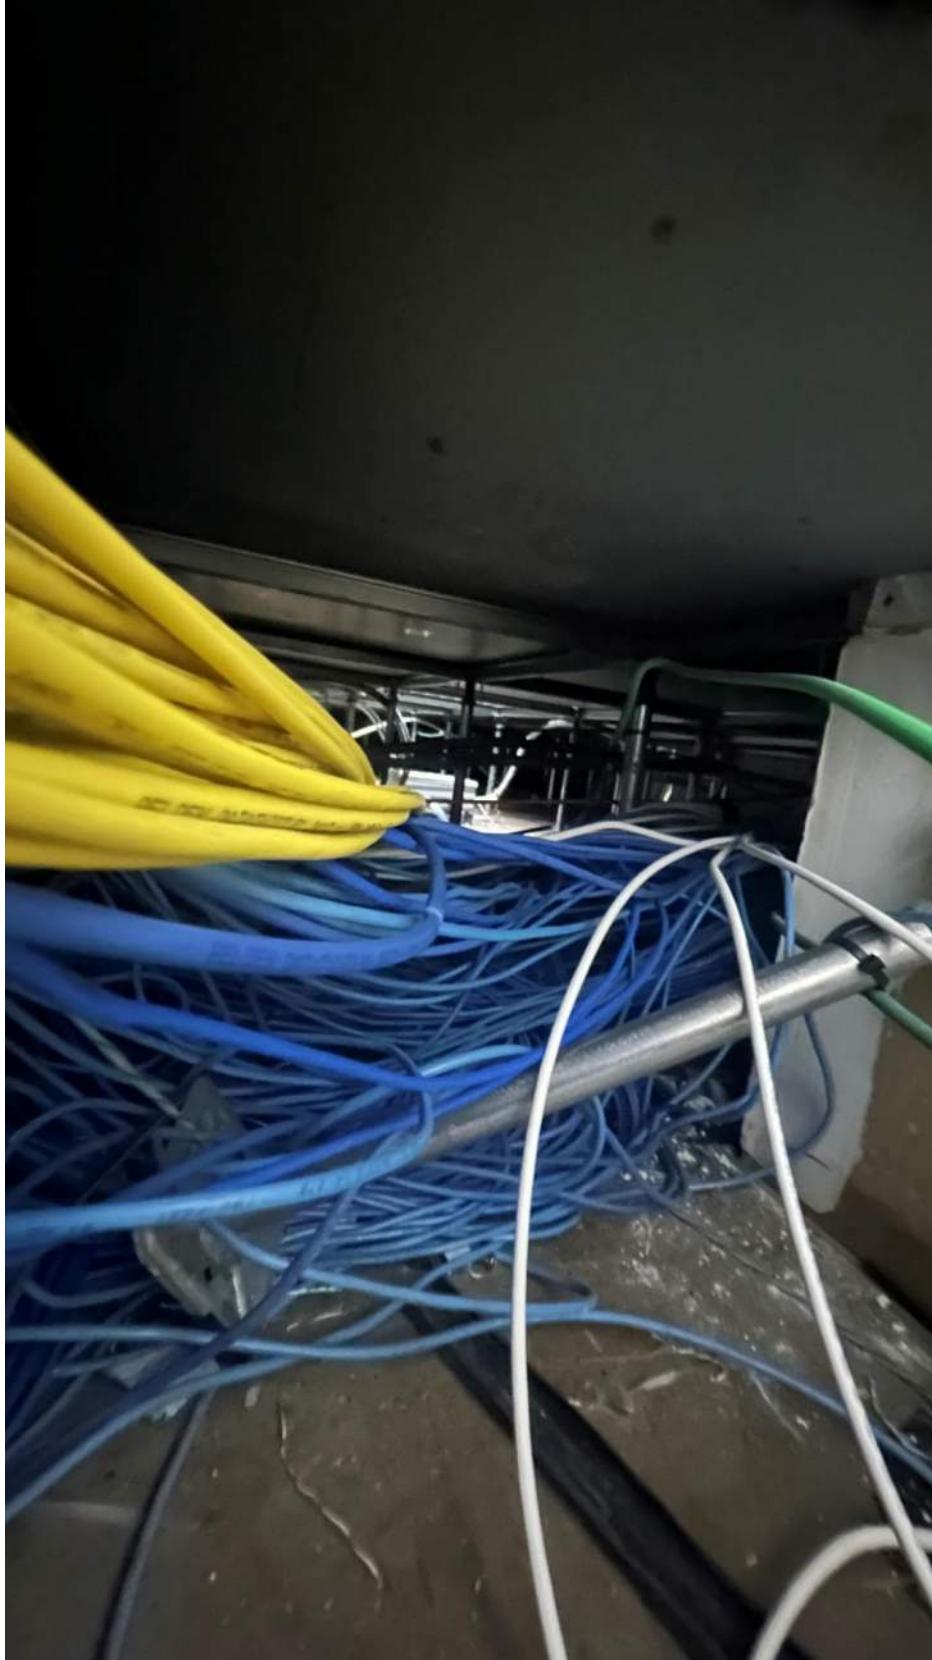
Brooke Claxton Building – IT Room Raised Floor Cabling
